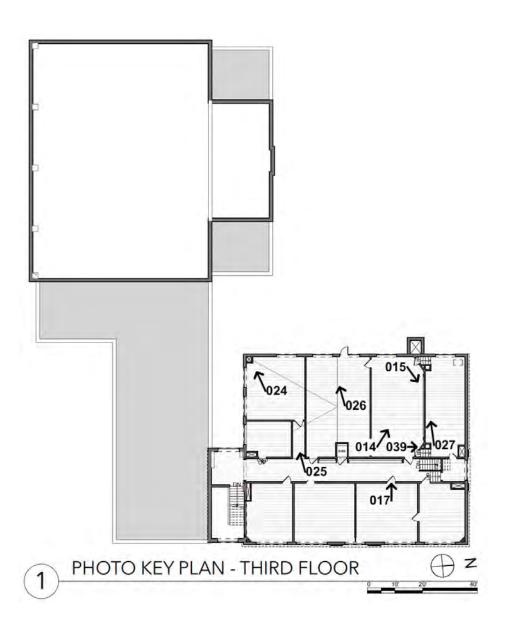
Photo key third floor plan. Drawn by Adam Davenport and Jake Decker.
